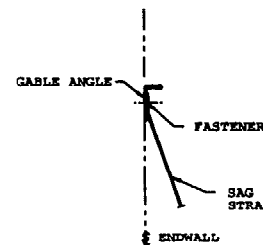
SAG STRAP PLACEMENT IN THE ENDWALL
